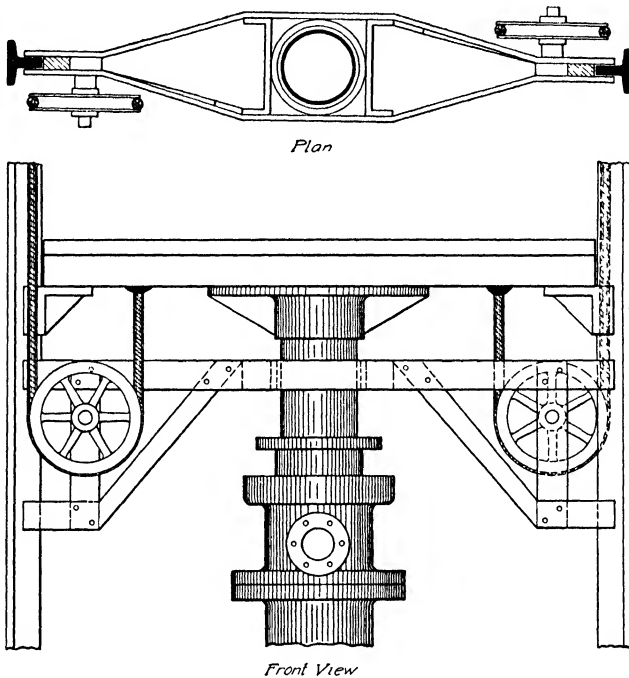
Hydraulic Elevator Plunger with Traveling Stay
